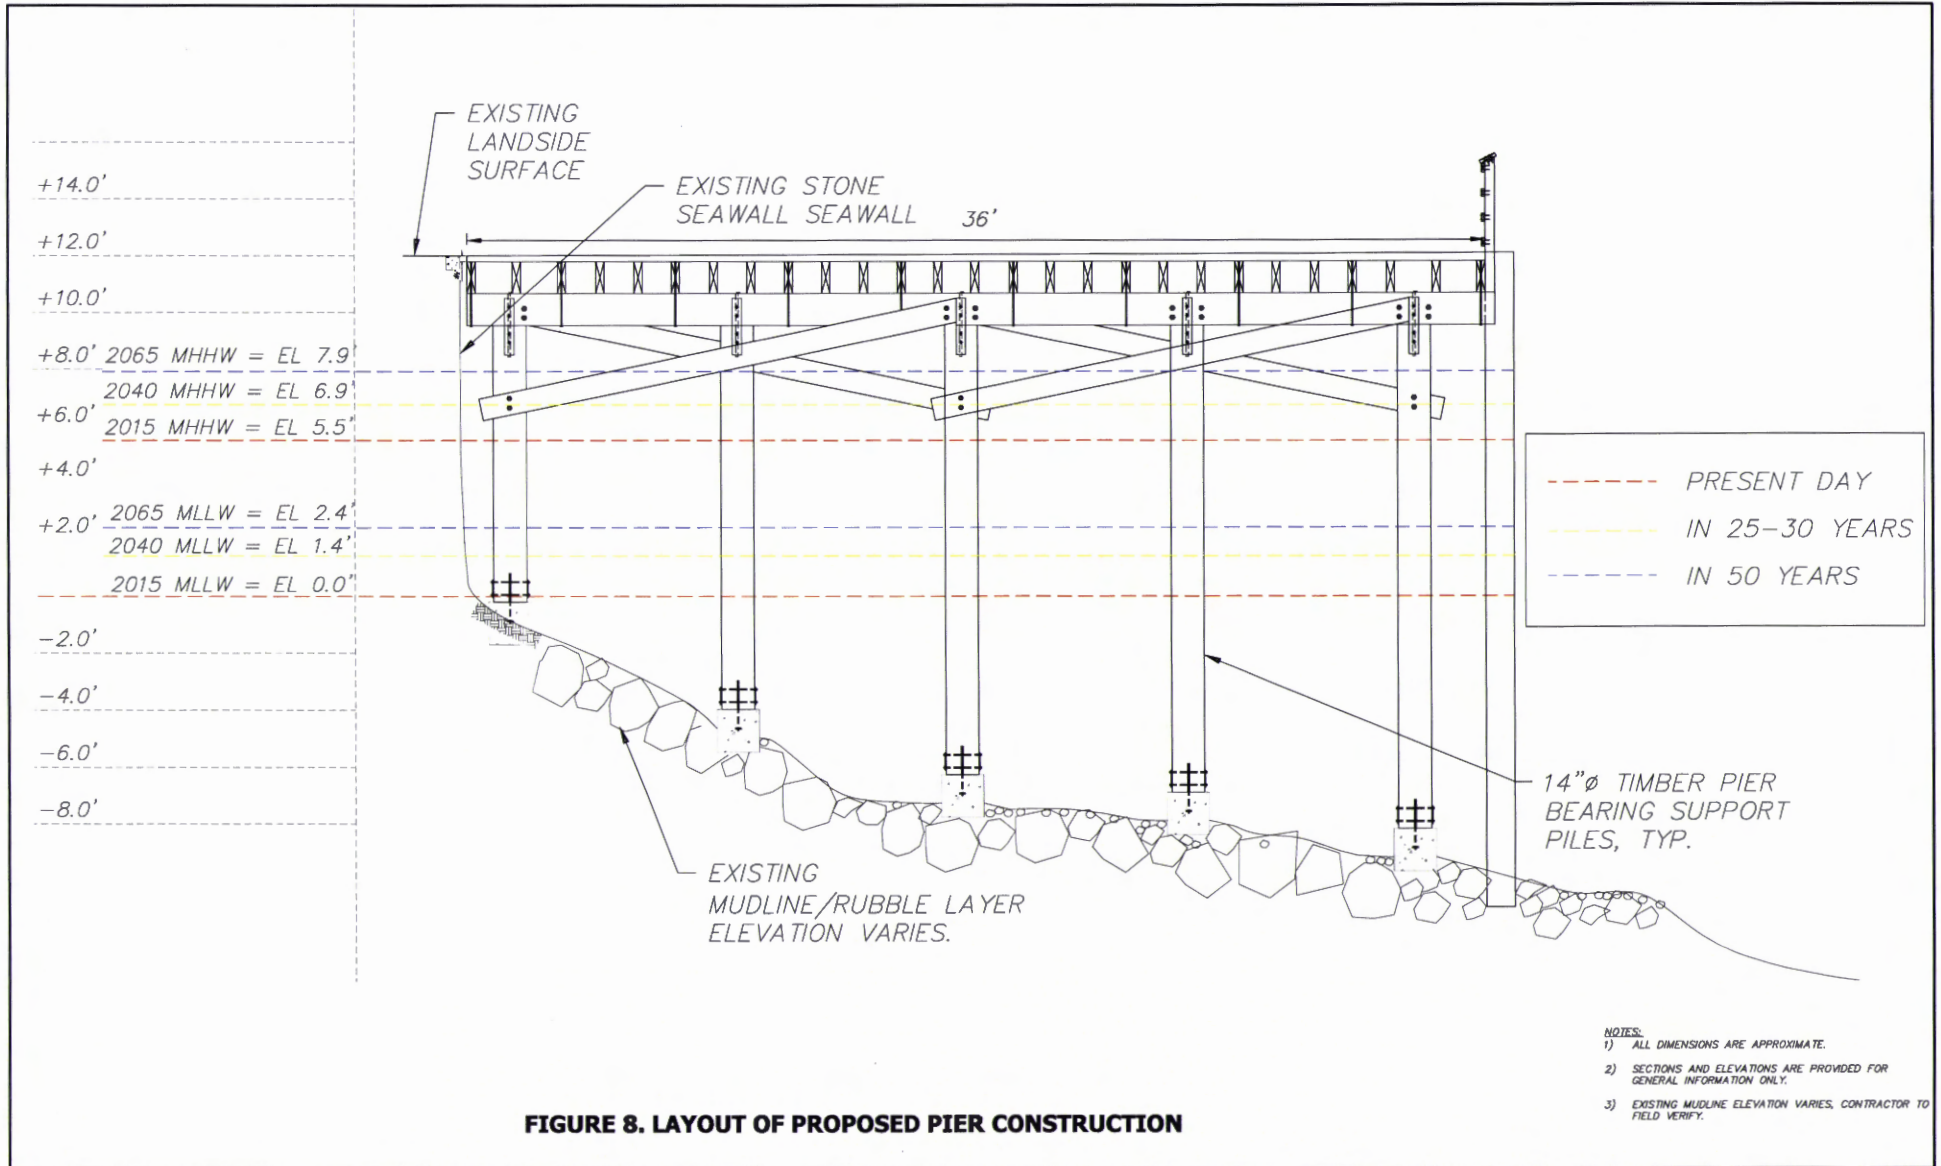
LAYOUT OF PROPOSED PIER CONSTRUCTION
